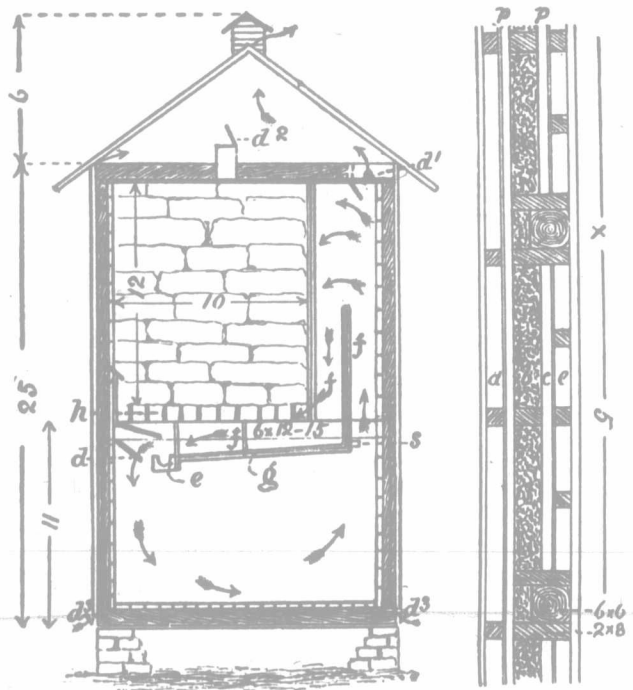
SECTION OF HOUSE. FIG. 69.—SECTION OF WALL.
